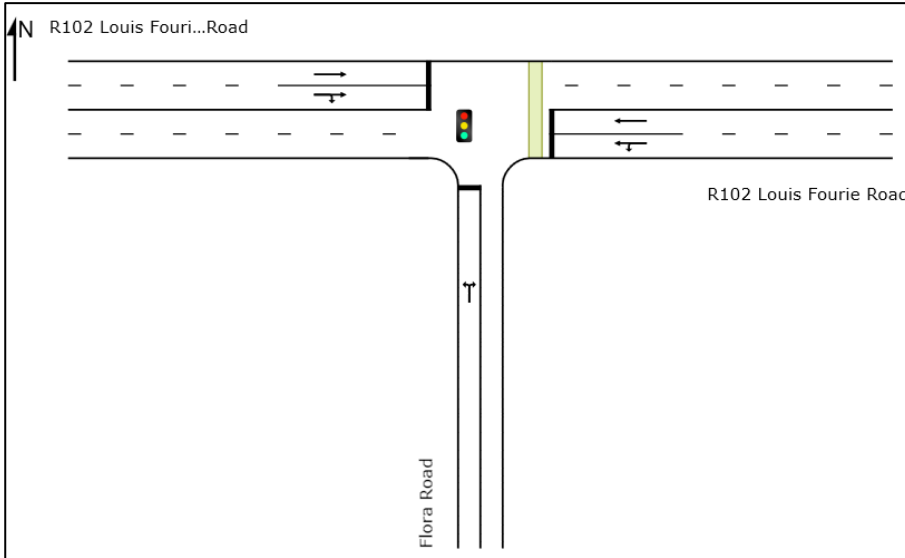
Existing Intersection Layout: R102 Louis Fourie Road and Flora Road
